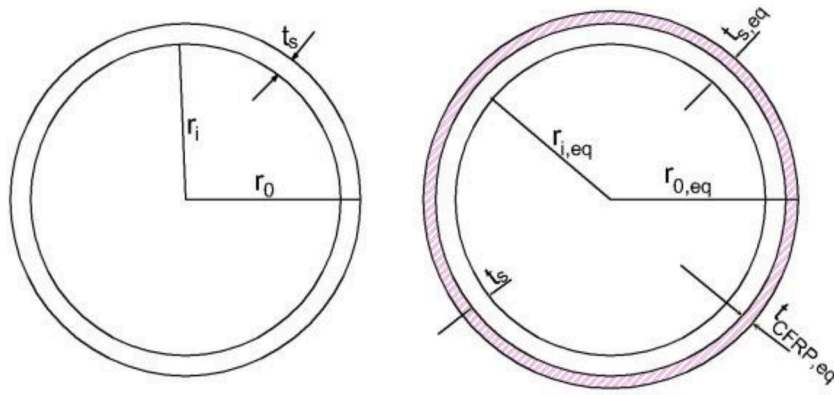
Section of steel tube (a) un-strengthened beam; (b) strengthened equivalent section.
